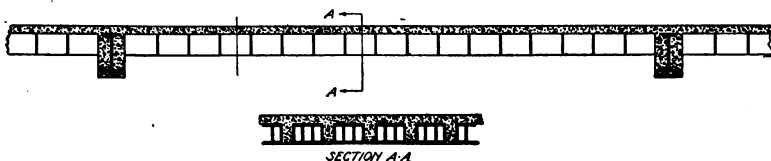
Floor Section Showing Combination Tile and Reinforced Concrete Construction
